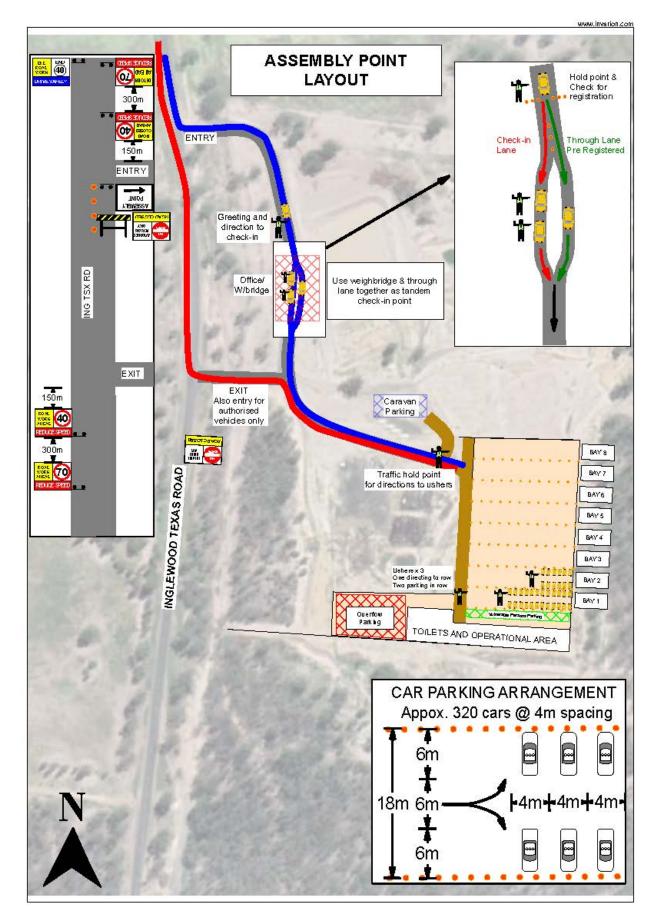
Inglewood Waste Facility – Assembly Point Layout Plan
